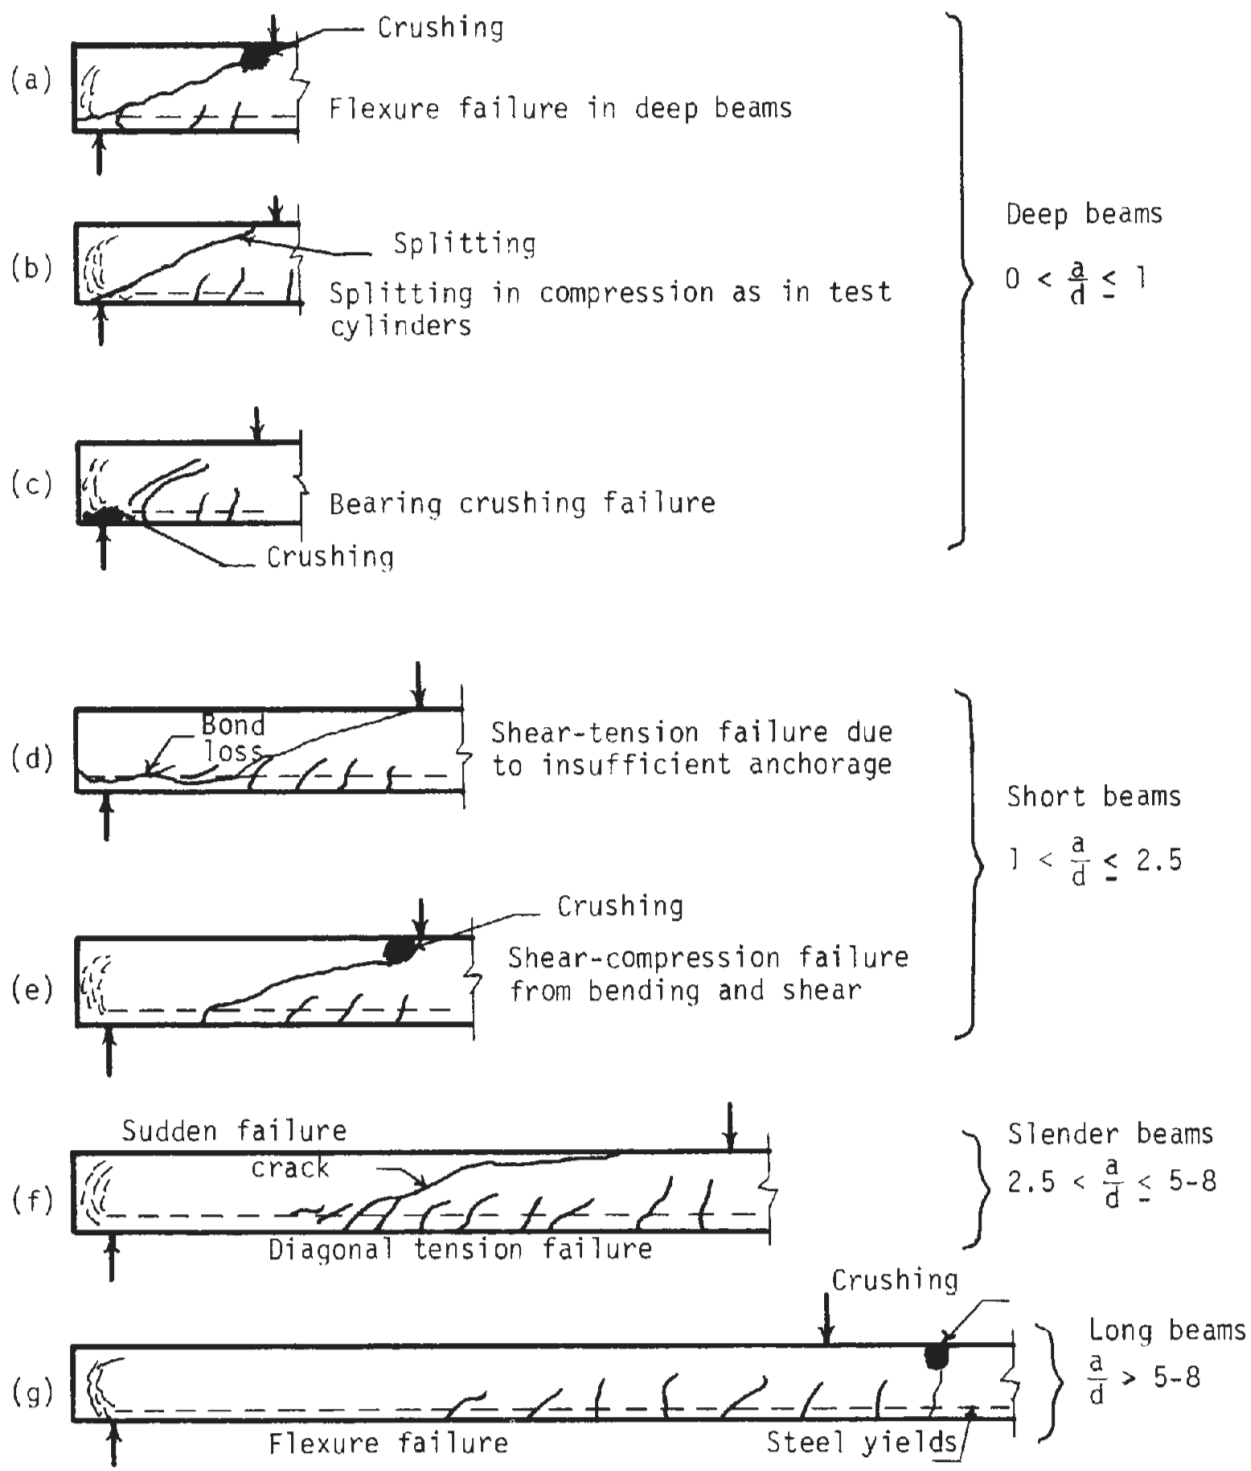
TYPICAL MODES OF FAILURE FOR CONVENTIONAL CONCRETE BEAMS WITHOUT SHEAR REINFORCEMENT
